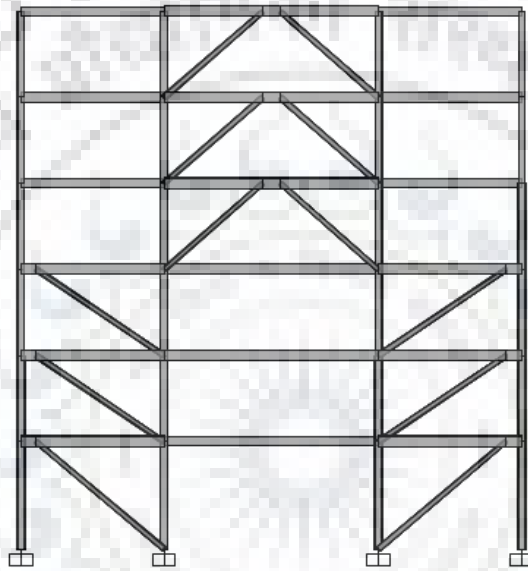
Elevation of the frame Ricles and Popov (1987)
